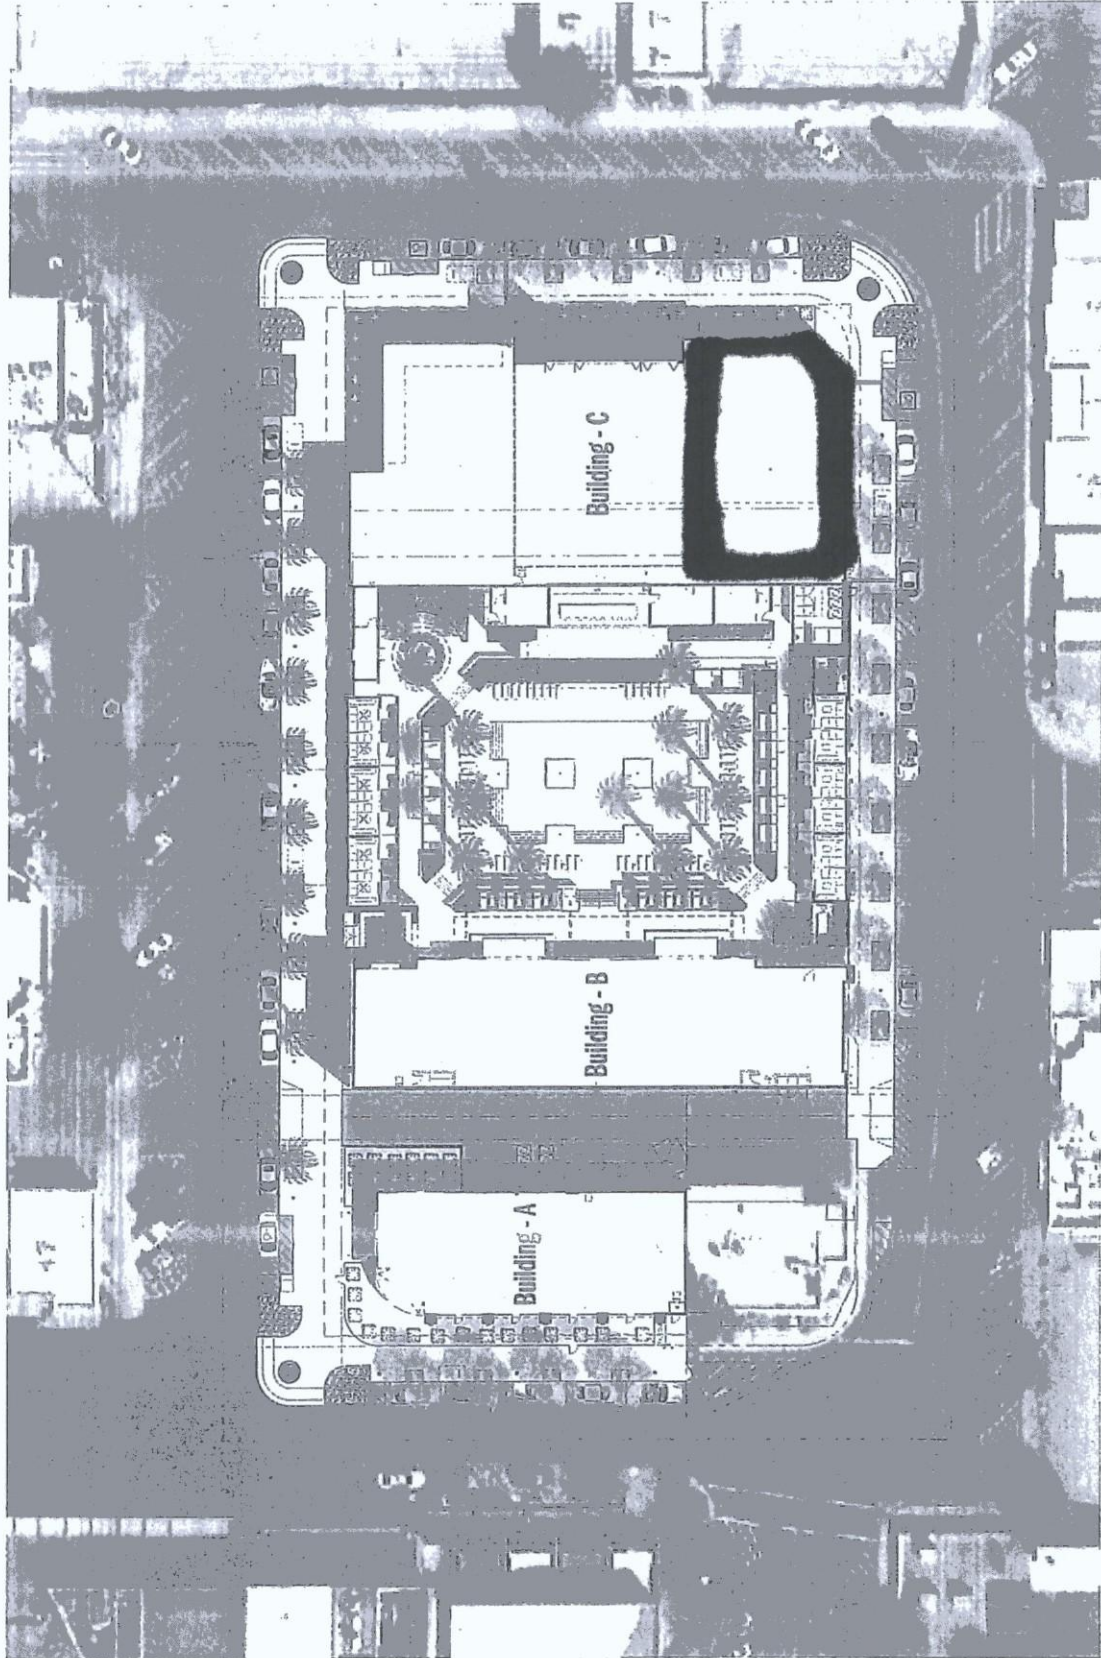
EXHIBIT B to ATTACHMENT 2: SITE PLAN
